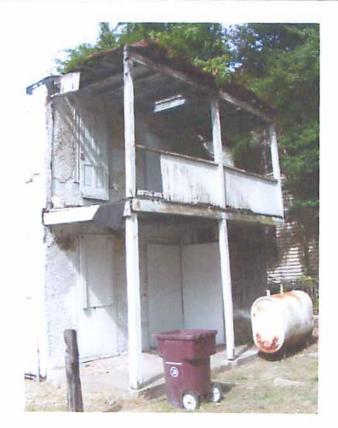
Structure #2238 - Rear Covered Porch - Corner Post Missing
